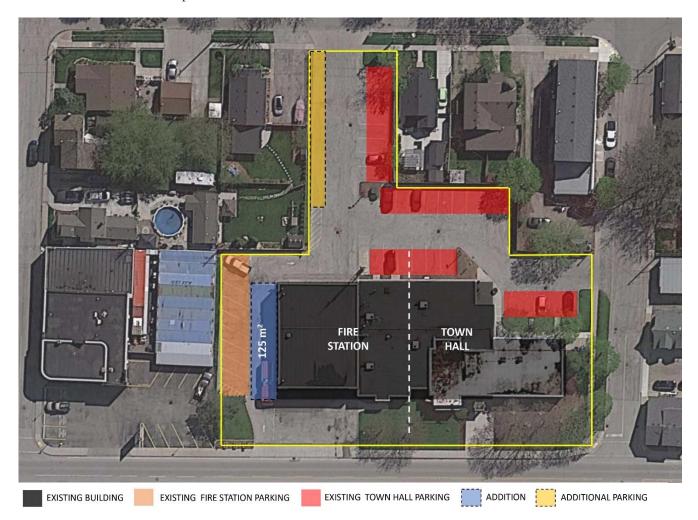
Fire Station 1 - Site Plan Expansion Potential
